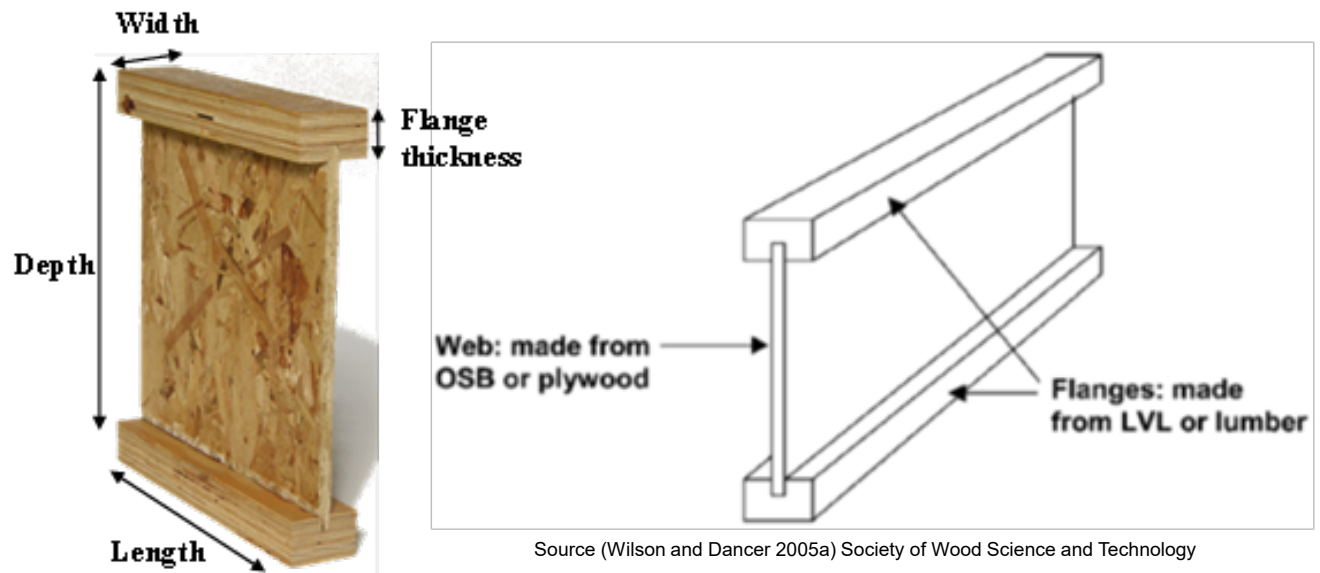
Typical composite I-joist made with laminated veneer lumber (LVL) flanges and an oriented strandboard (OSB) web.
